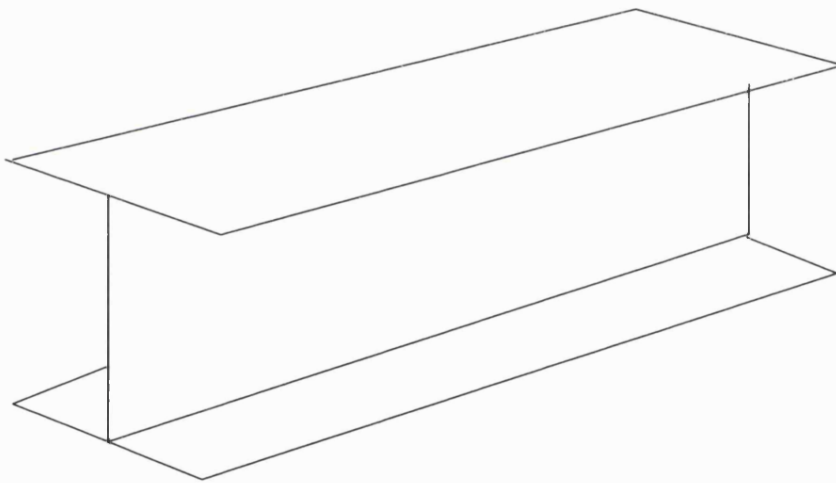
LLW STEEL GIRDERS USED AS TRIALS SPECIMENS
